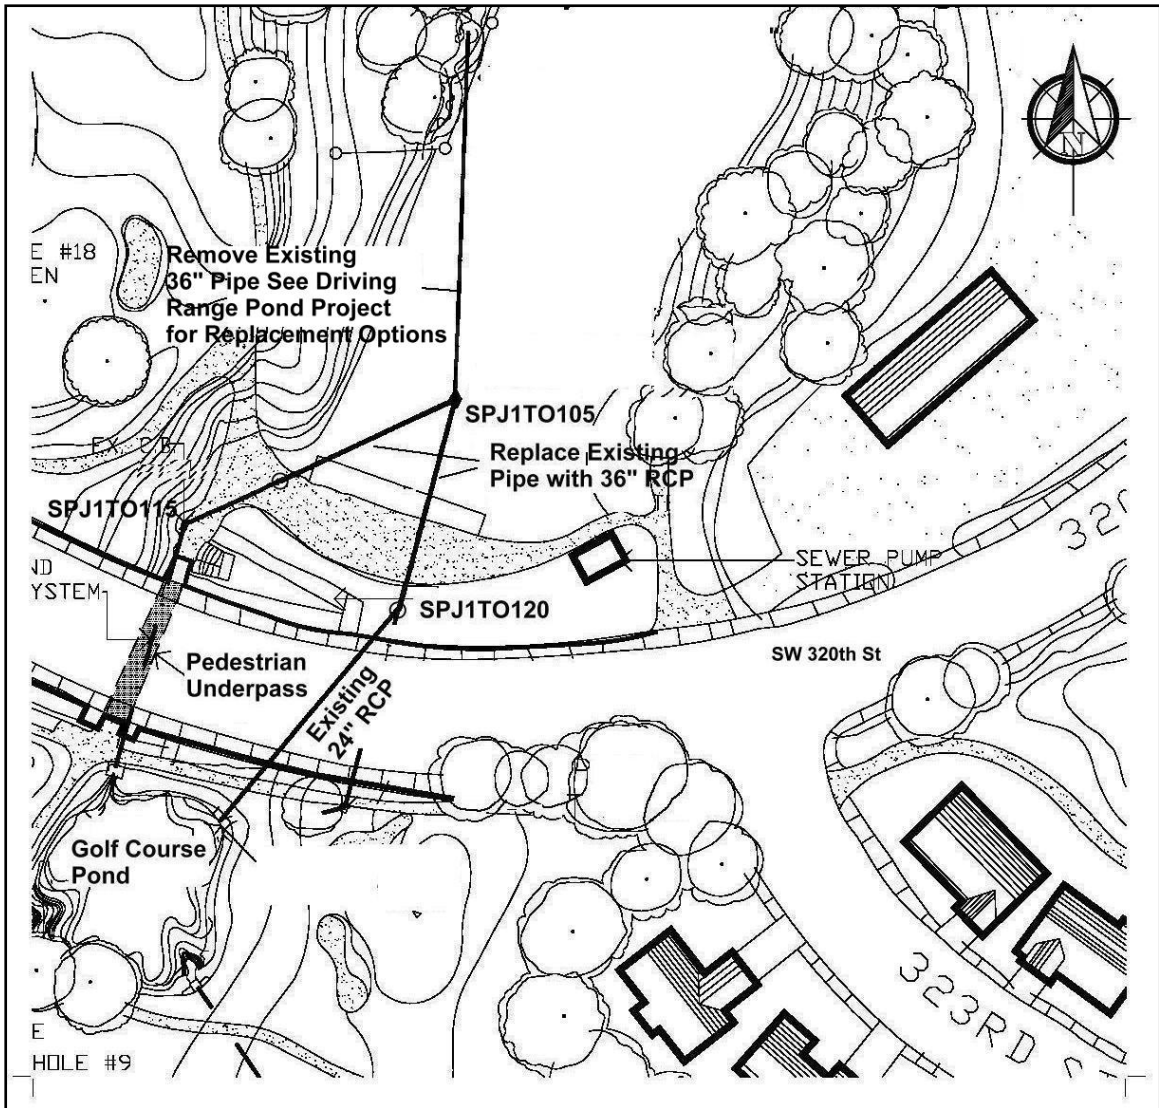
Project JOE-13, Twin Lakes Golf Course Pond Outlet Pipe Improvements
